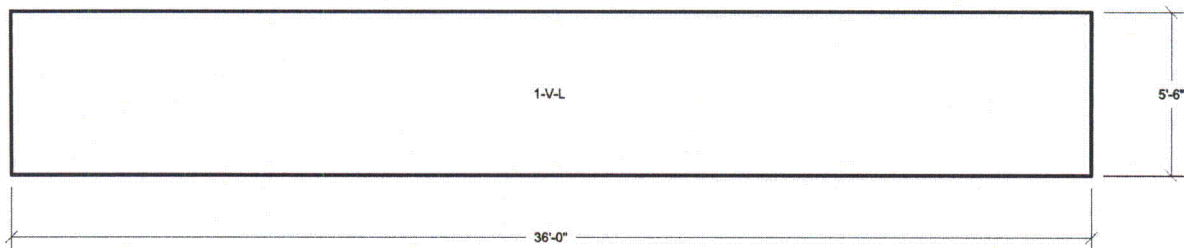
H.7-17: Tunnel and Access Region Basemat Looking Down
